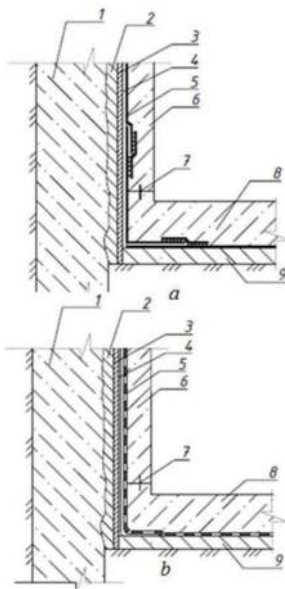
Waterproofing of structures without slots for backfilling: *a* – using factory-made membranes; *b* – using sheet waterproofing with a surface layer of sprayed compositions with two-sided adhesion; 1 – enclosing ‘diaphragm wall’; 2 – levelling layer of fine-grained concrete or false wall; 3 – layer of geotextile fabric, expanded polystyrene boards or profiled membranes; 4 – sliding plane; 5 – waterproofing coating; 6 – permanent wall; 7 – waterproof core; 8 – trough slab; 9 – base concrete.
